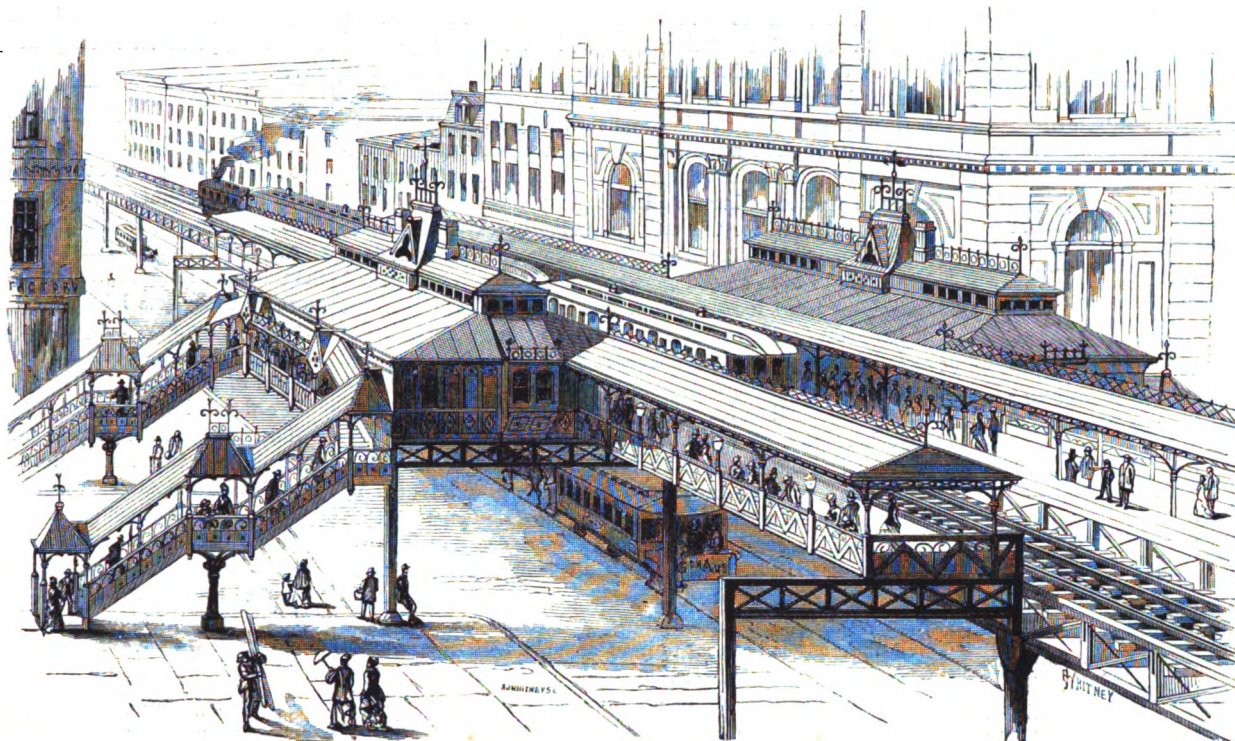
ELEVATED RAILROAD STATION, 23D STREET, NEW YORK
